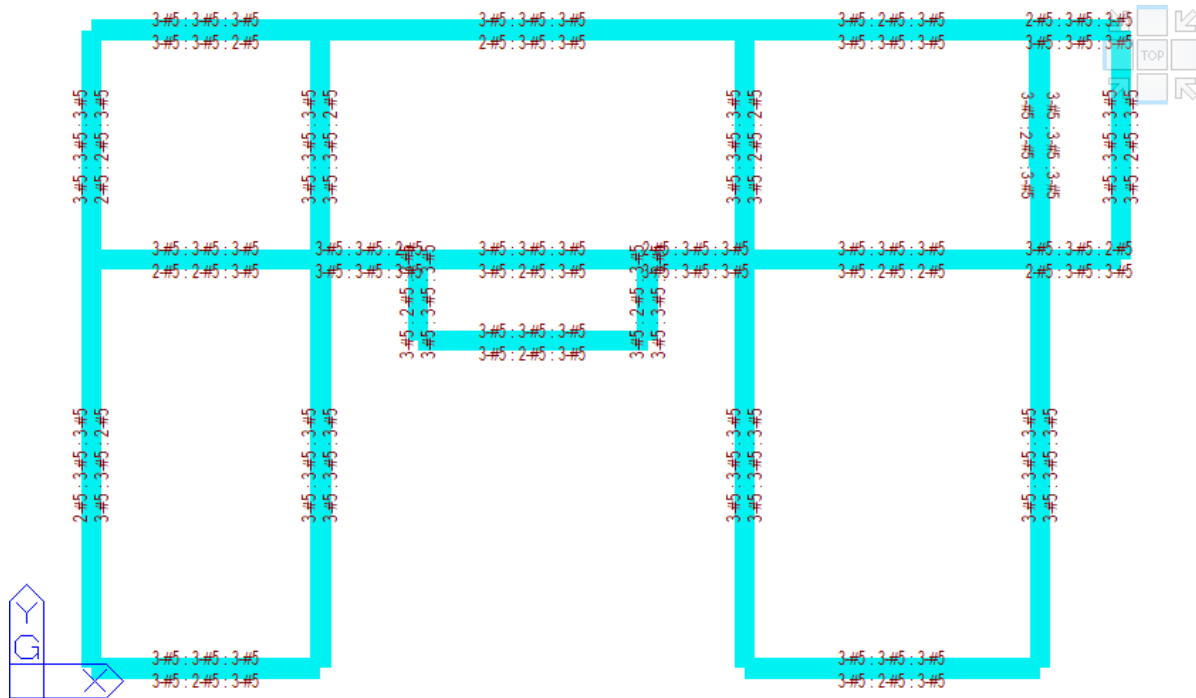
Minimum longitudinal rebar distribution - Plan view.
